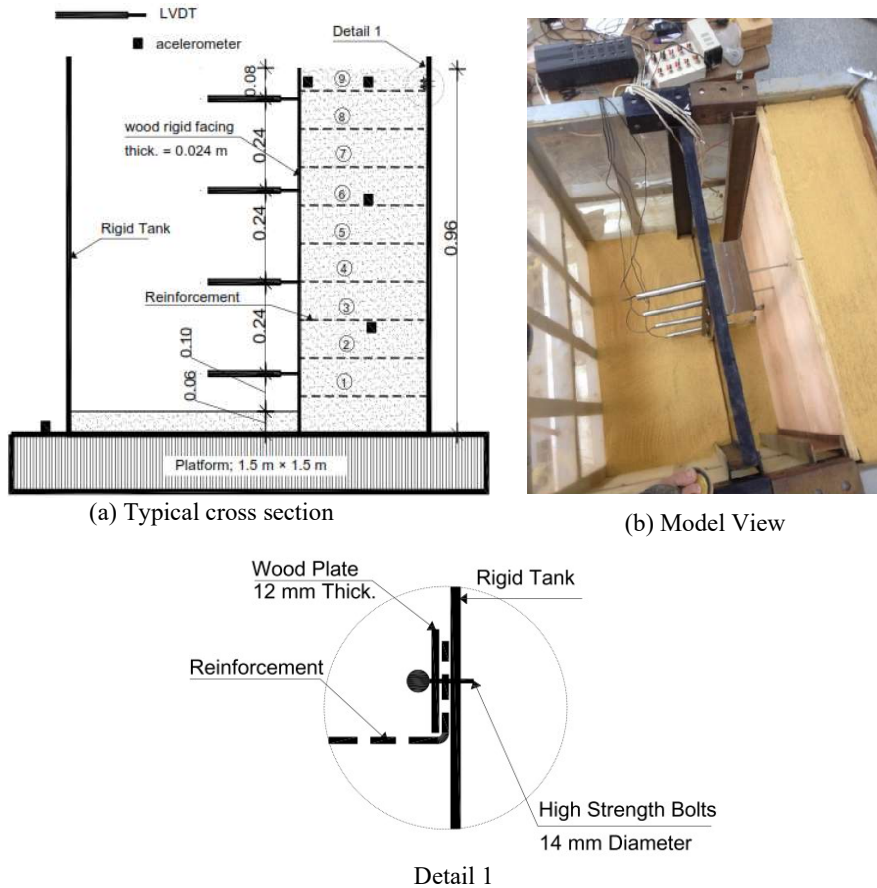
Instrumentation layout and details of reduced scale NMSE wall (all dimensions in m). (a) Typical cross section and (b) Model View
